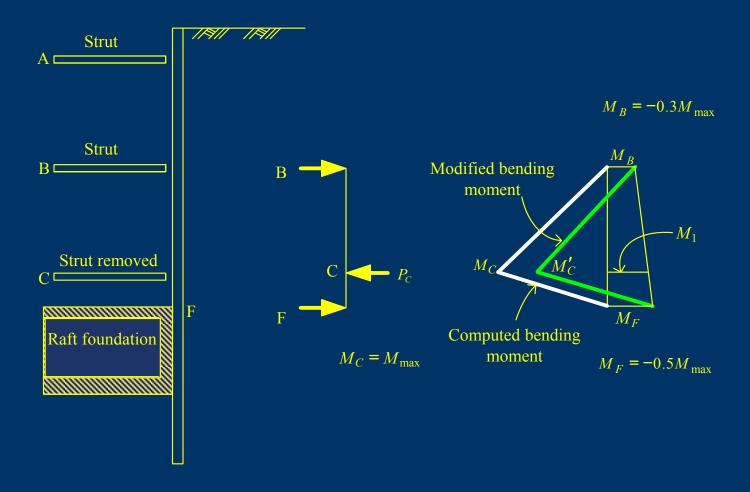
Phased loading assumed support at the stage of strut demolition
